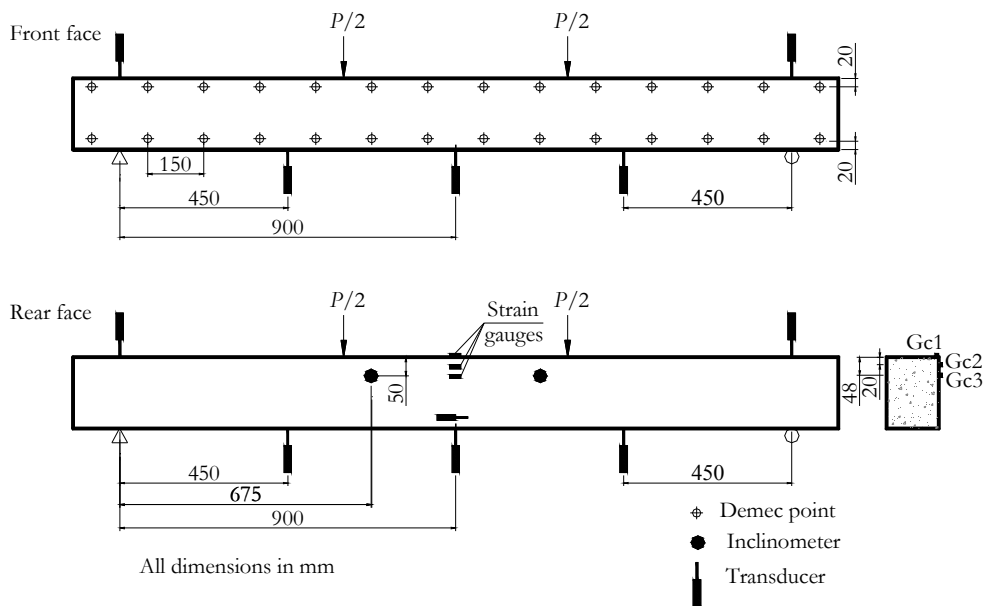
Instrumentation details for beam C1-212-D1-B.
